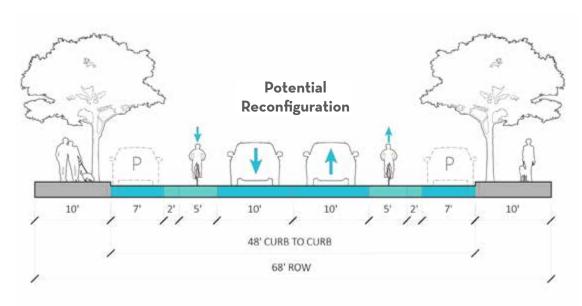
Potential Reconfiguration: One-Way, Buffered, Class II Bikeway on a Neighborhood Collector Street.
